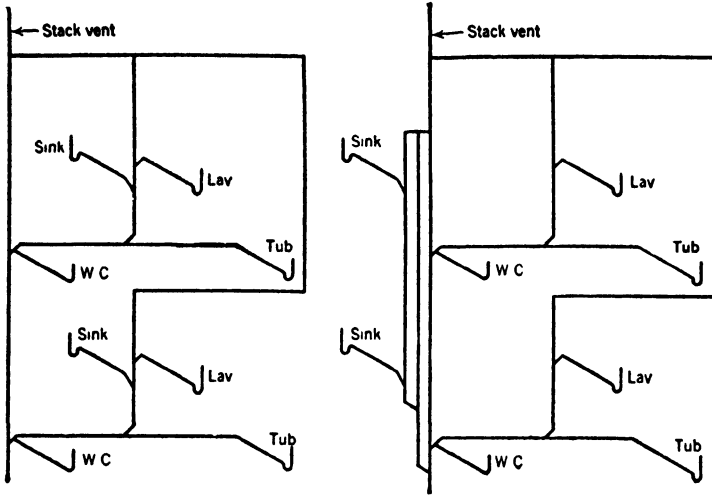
Piping Layout for Bathroom in Each of Two Stories.
